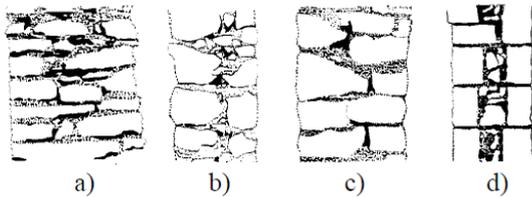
Stone Masonry classification by cross section: a) single leaf or solid, b) two leaves without connection, c) two leaves with connection, d) three leaves (Figure Courtesy : [18])
